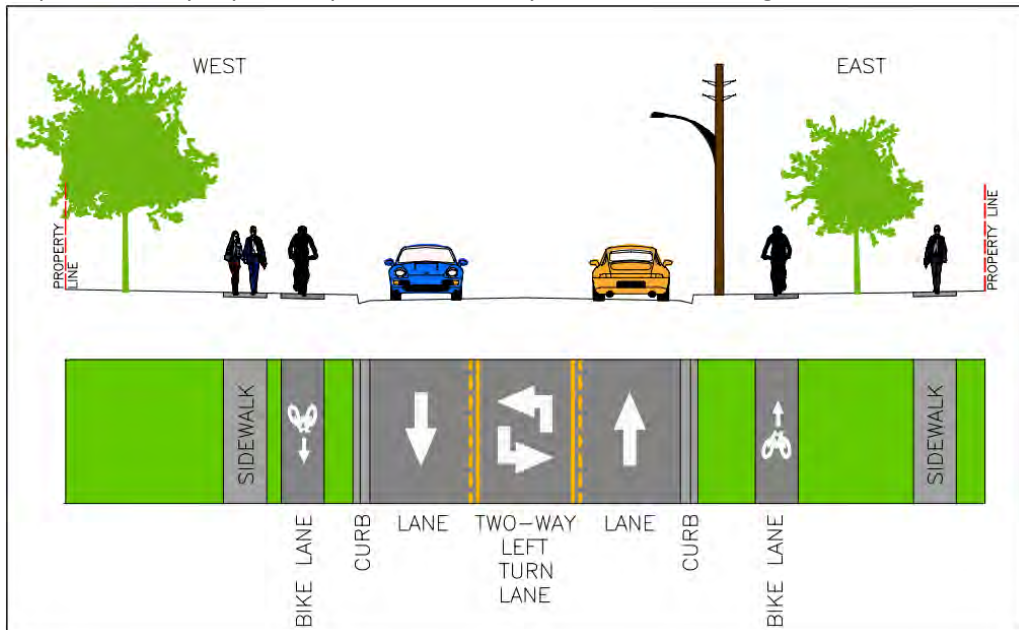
Option 2 – Continuous sidewalks and protected in-boulevard bike lanes on both sides of the road
